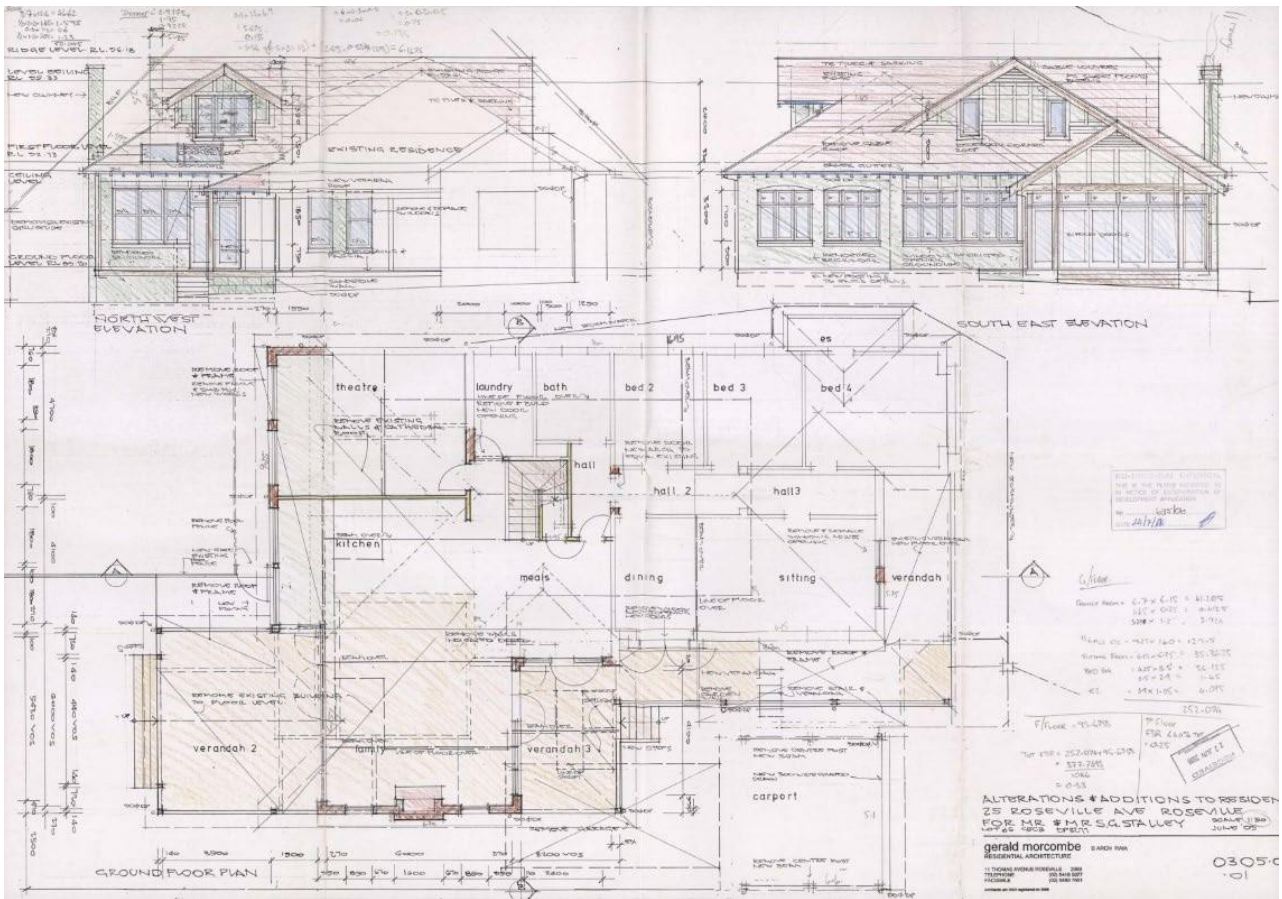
Proposed plans and elevations for alterations to the dwelling dating from 2009
